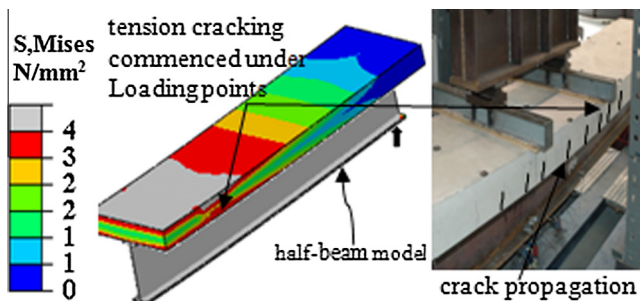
Tension cracks developing in the concrete slab.
